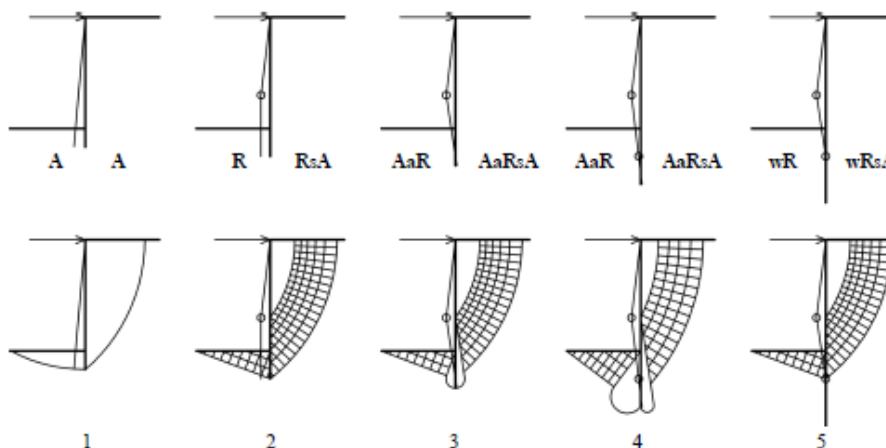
wall movements and rupture figures Brinch Hansen [23]
